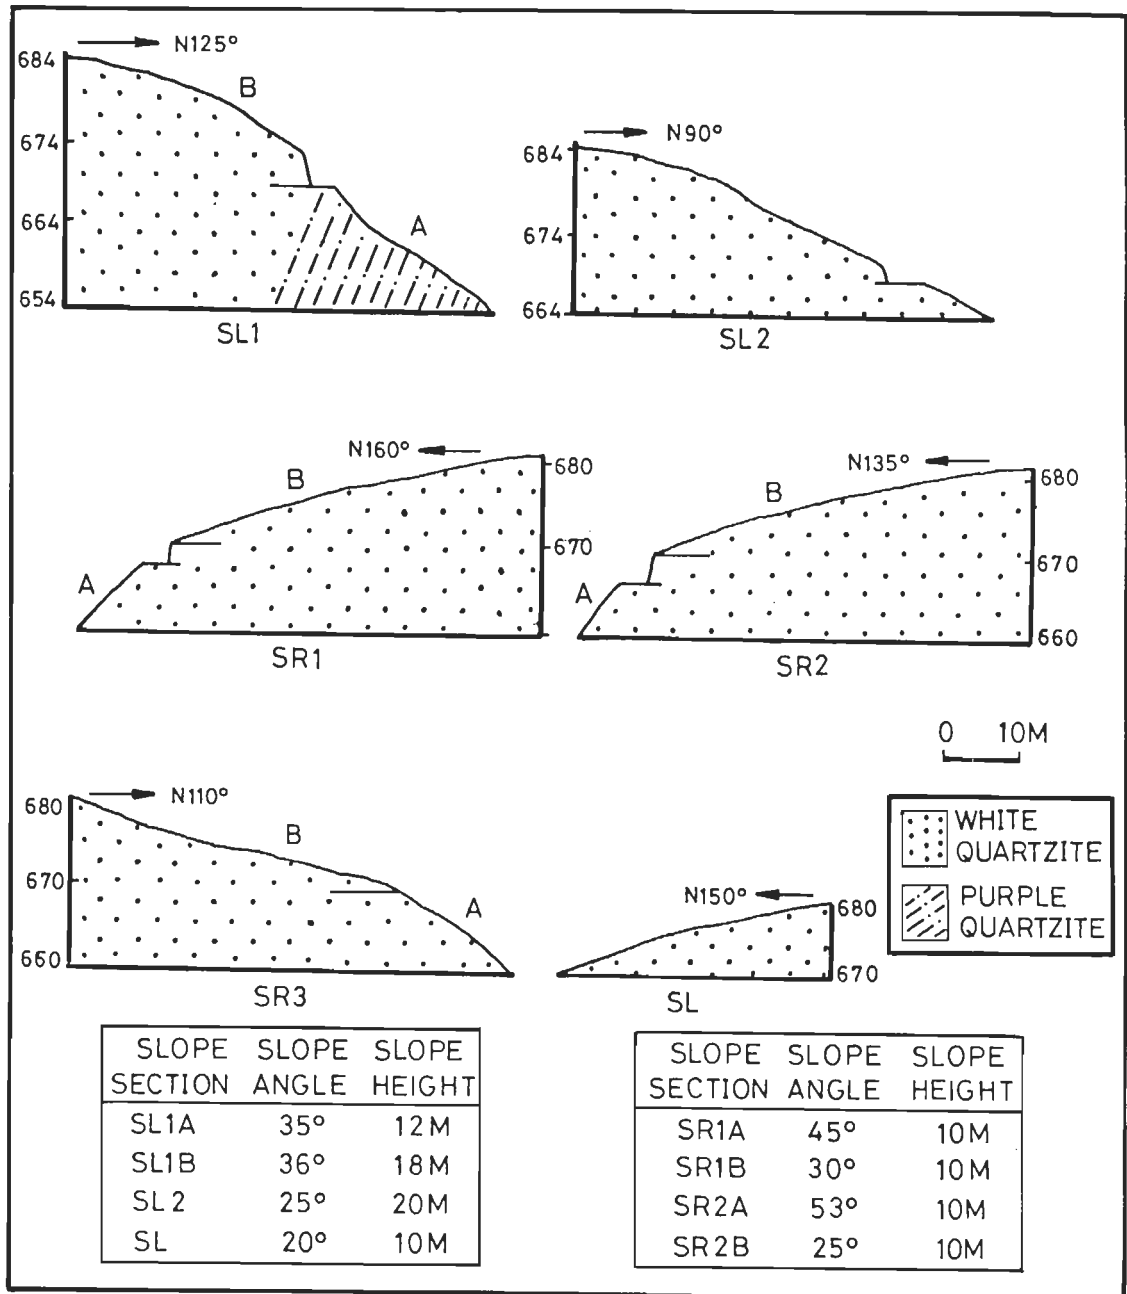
GEOLOGICAL CROSS SECTIONS OF SLOPES ADJOINING TO POWER HOUSE SITE.
